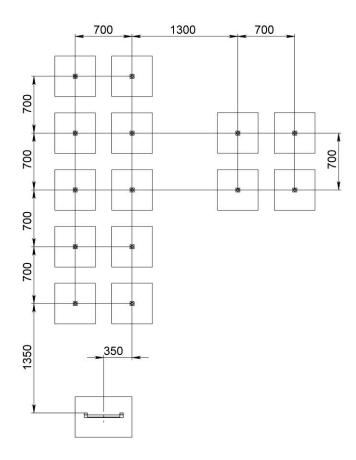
Completeness and assembly scheme of the ladder with handrails to the complex TL102, TL103
